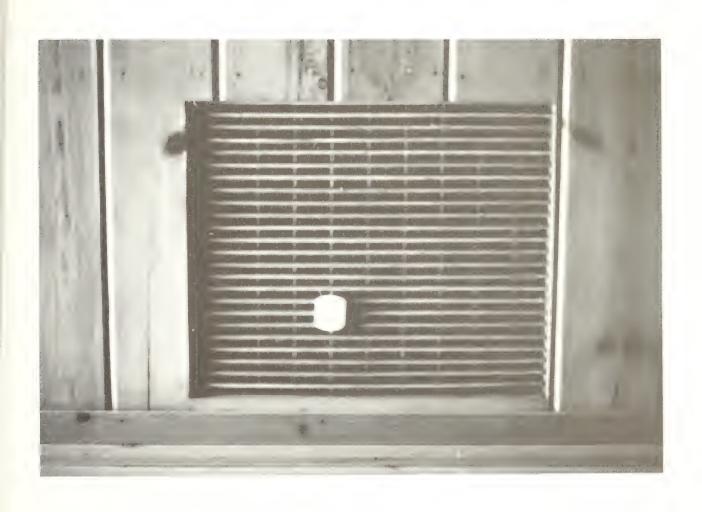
Market--Ceiling Mounted Wooden Ventilation Grill (5/86).
